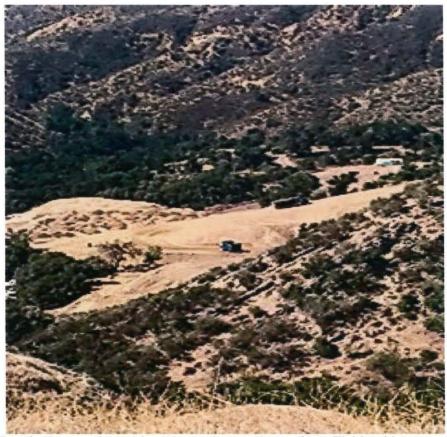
View facing southwest into the active portions of Mr. Fishback's property with trucks transporting material toward the west road and berm.
